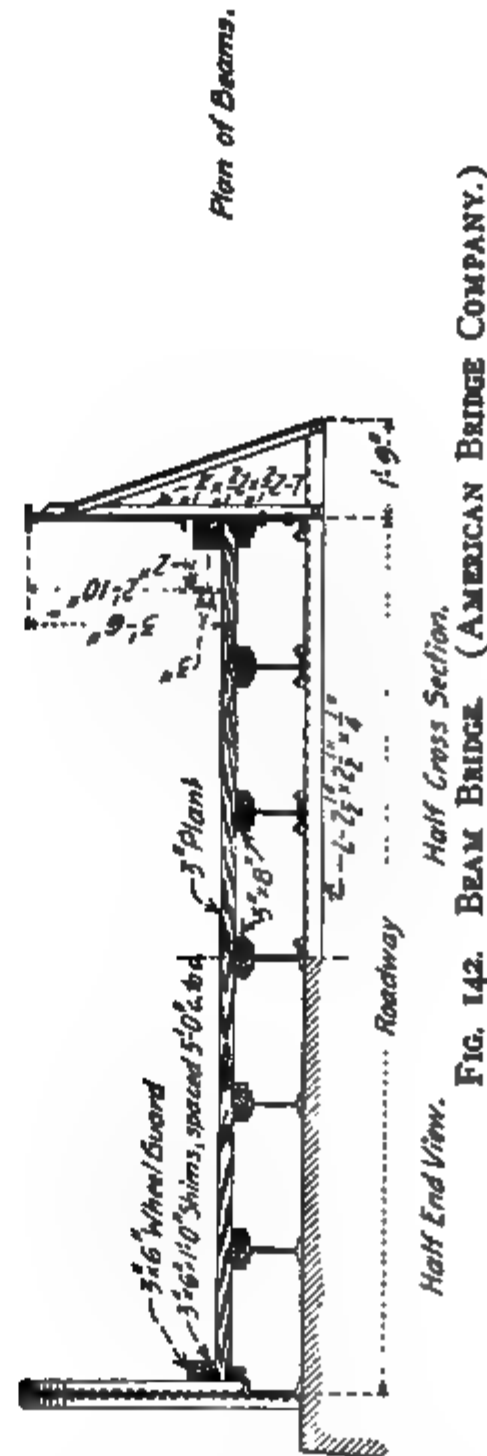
BEAM BRIDGE (AMERICAN BRIDGE COMPANY.)
